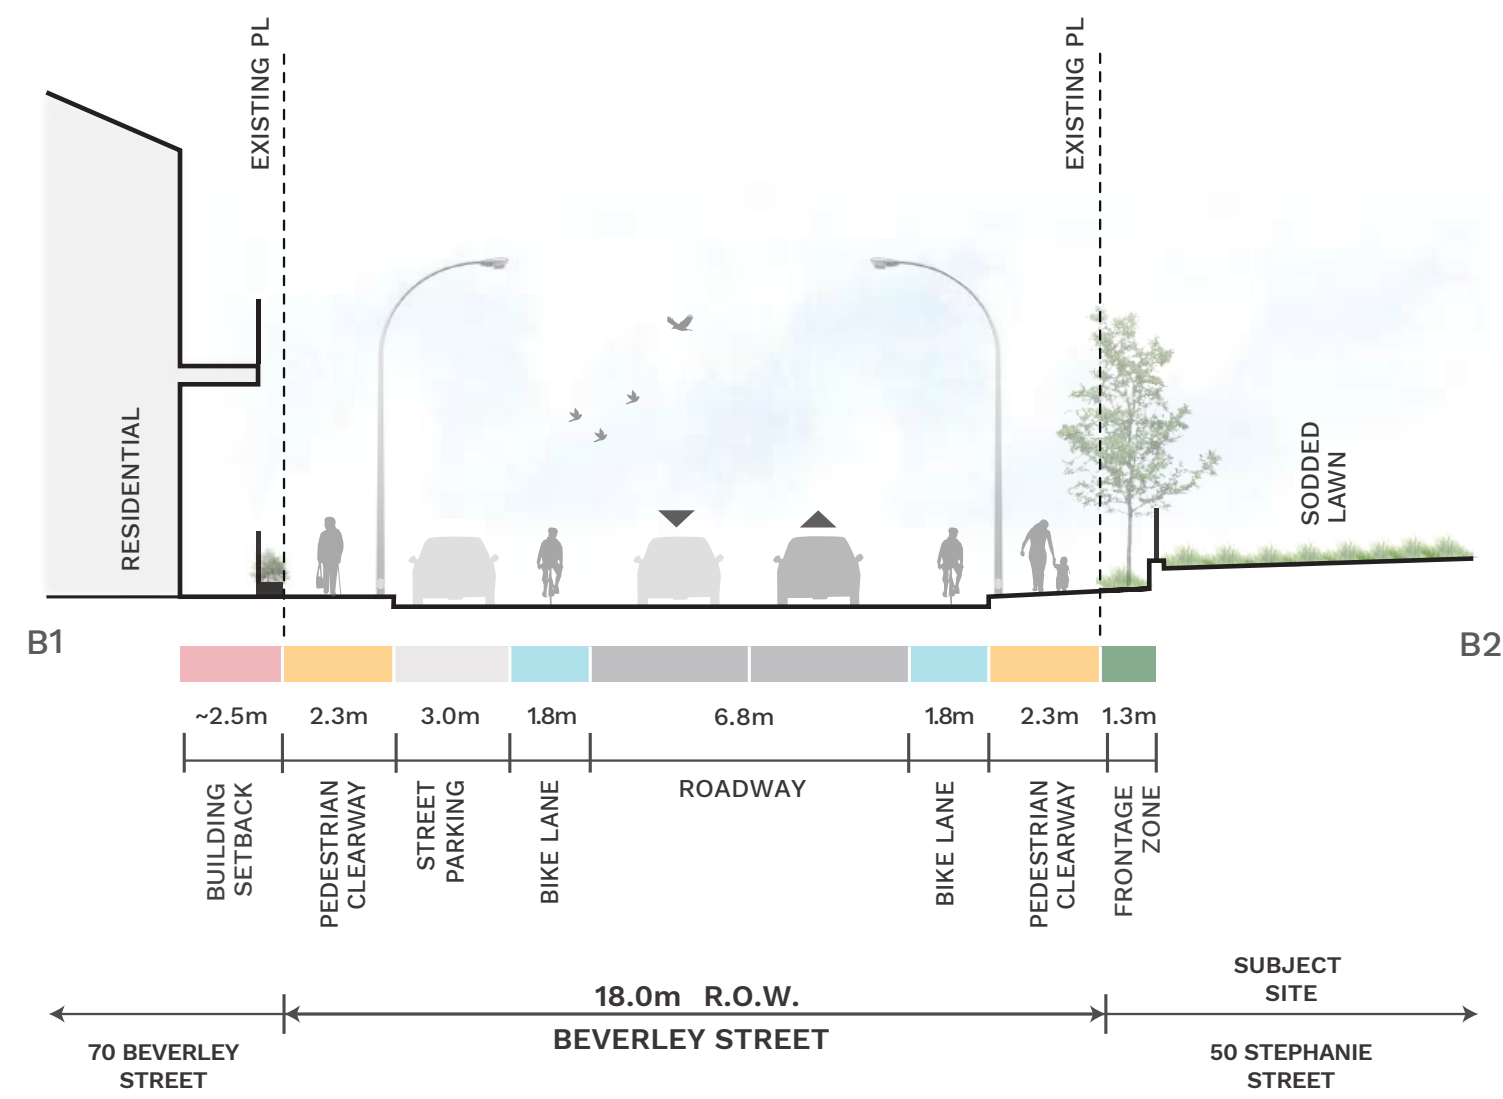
Existing Street Section - Beverley Street (Looking North)
